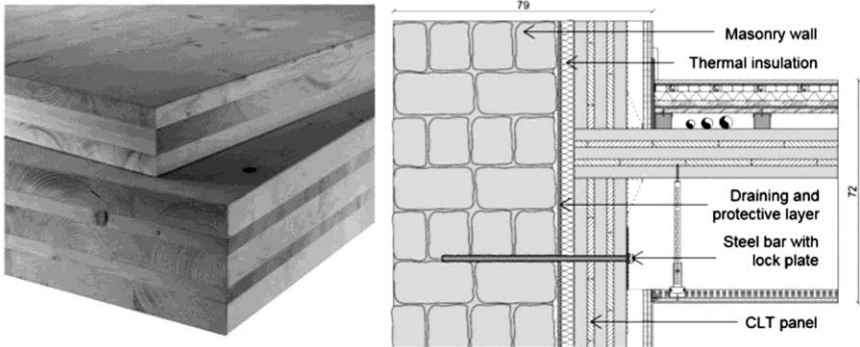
On the left, CLT panels and, on the right, the wall-slab detail and the connection with masonry.
